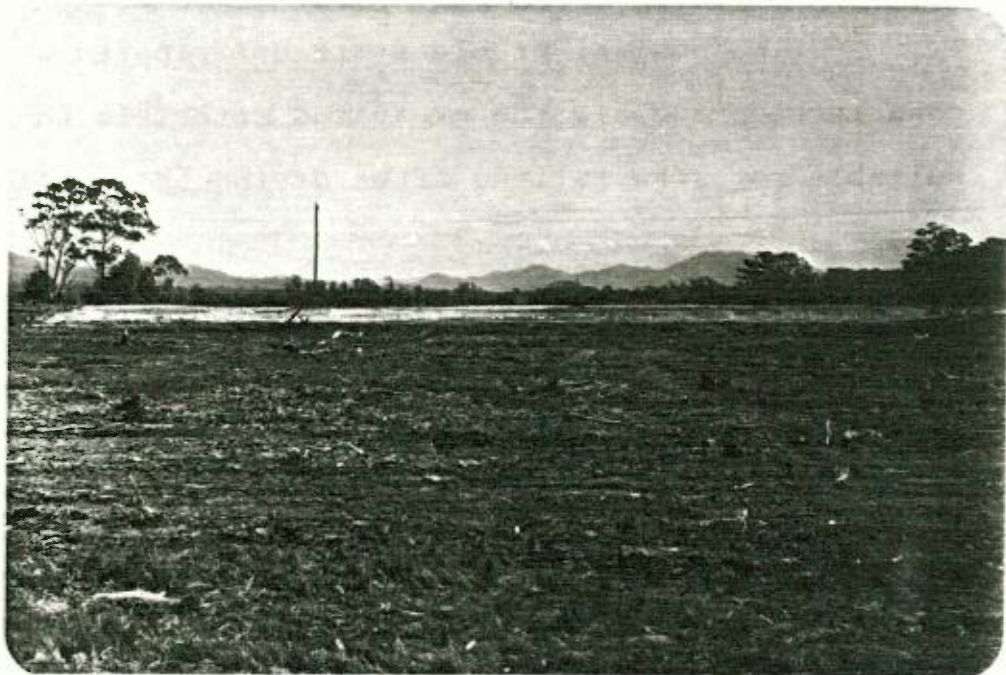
"Existing Approval - Partly excavated 'Floodway'"
